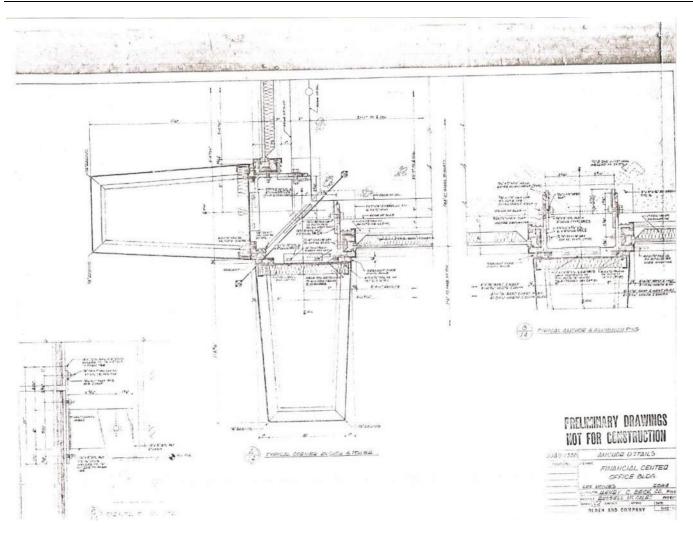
Historic drawing of Financial Center typical anchor detail for fins and curtain wall at corner of tower, undated. (Financial Center drawings, Russell McCaleb architect, Olden and Company curtain wall).
